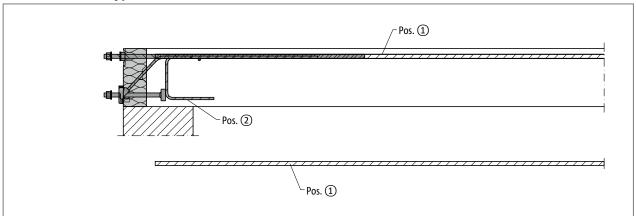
Schöck Isokorb® T type SK-M1: On-site reinforcement: Cross section
